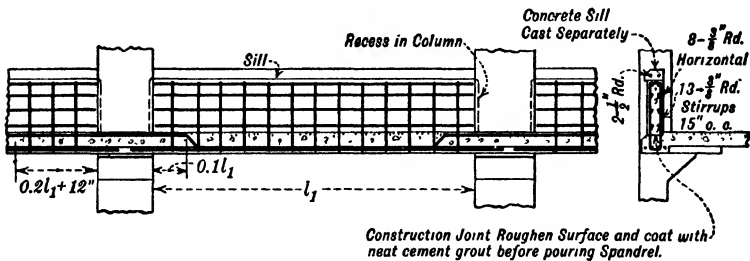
Concrete Spandrel Built Separately. (See p. 383.)
